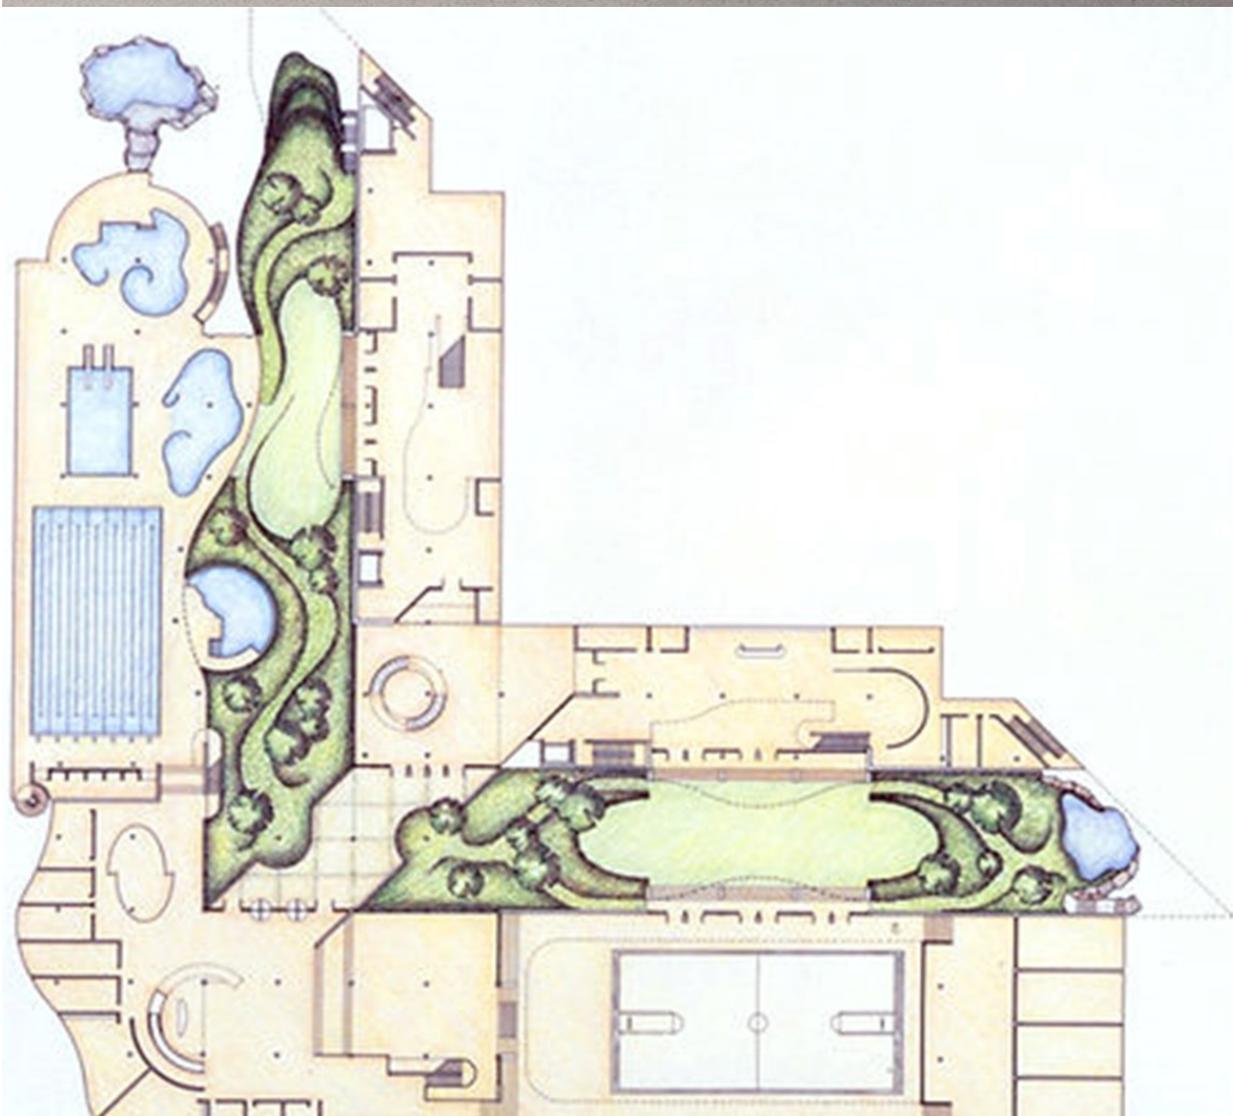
The Mikal Cultural Center in Shin-Sanda, Japan (1994) by E. Ambasz. Section, the ground floor plan
